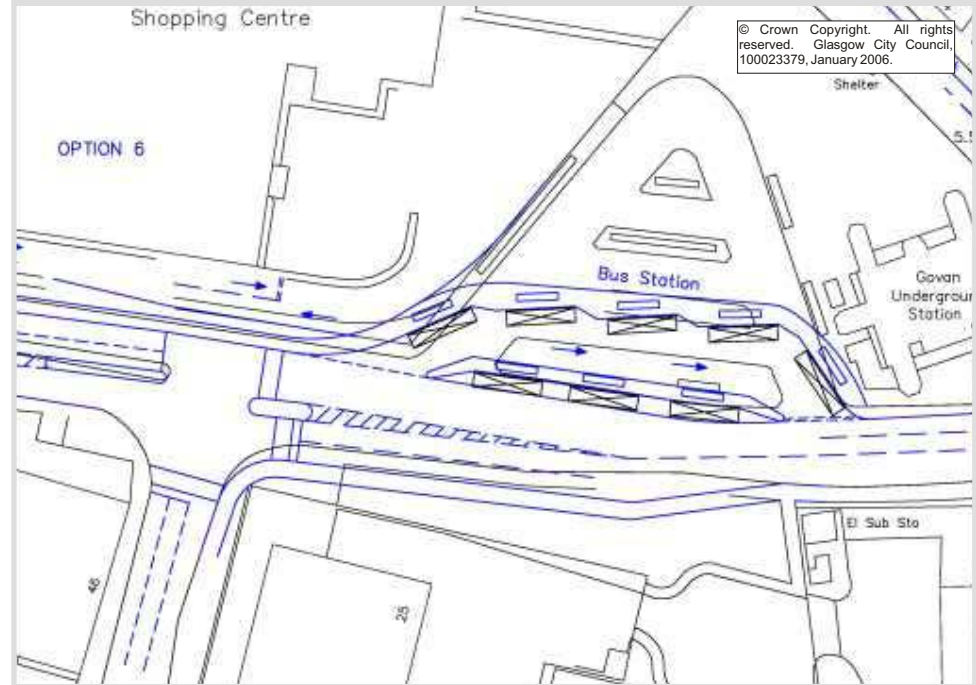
GOLSPIE STREET / GOVAN ROAD (EAST)
